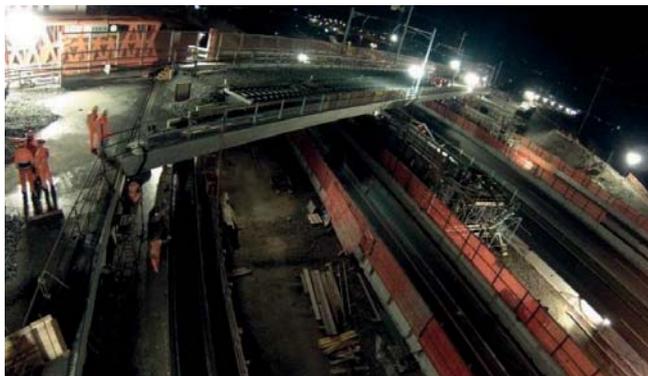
Removing the ballast adjacent to the transverse couplings of the railway bridge and preparing the ground for installing the future track on the structure at the planned project level.
